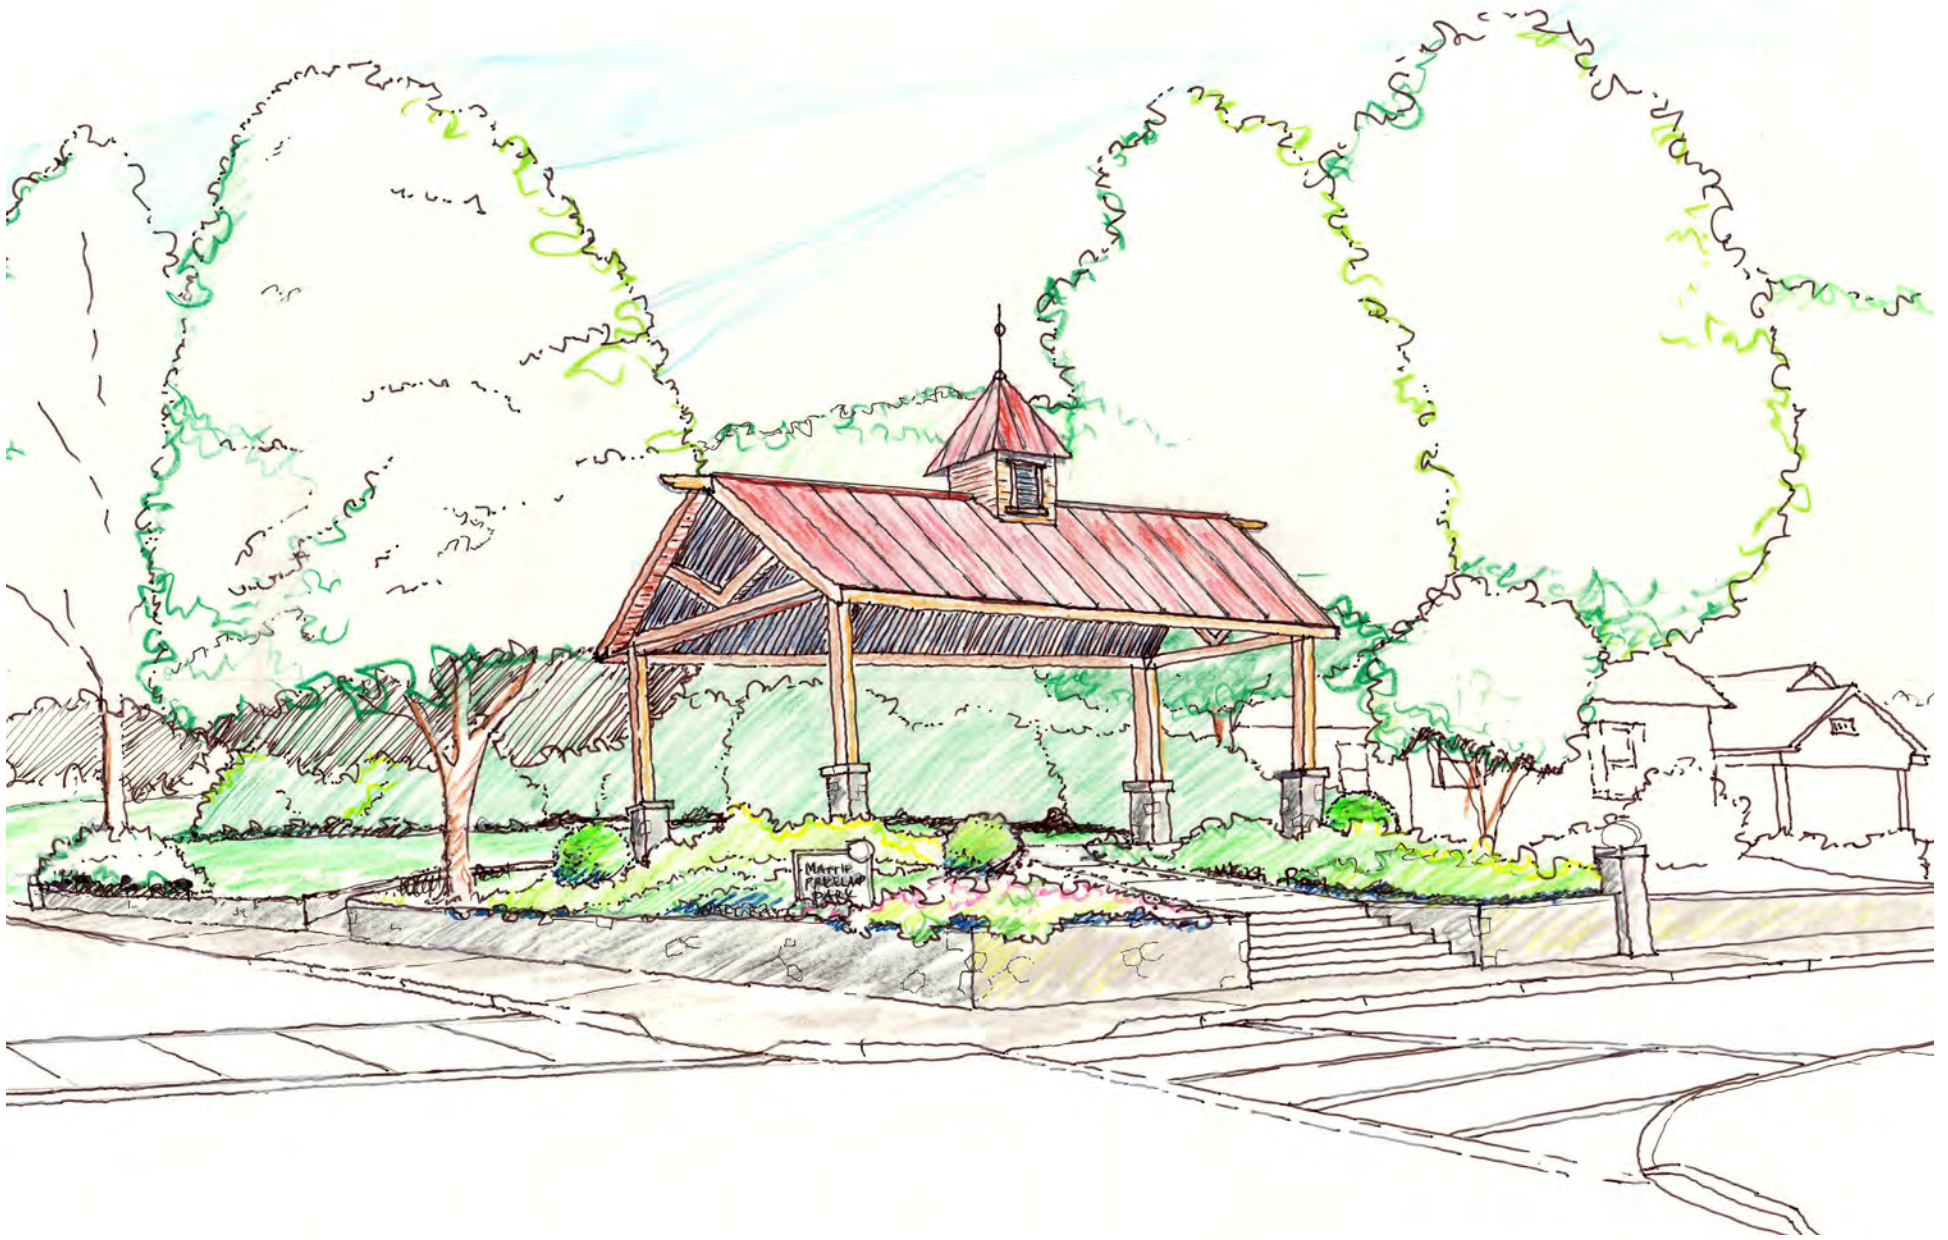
Perspective Drawing of Family Pavilion at Griffin and D'Alvigny Streets (Item P-16 on Vision Plan)
